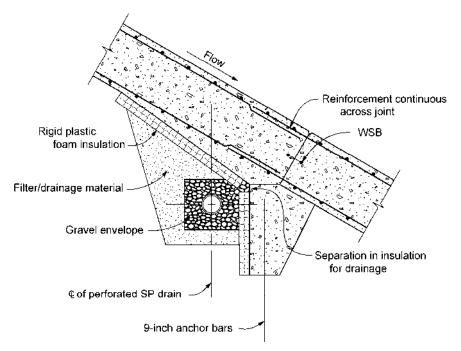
Defensive design measures for concrete chutes to prevent uplift failure (Reclamation, courtesy of Bill Fiedler).
